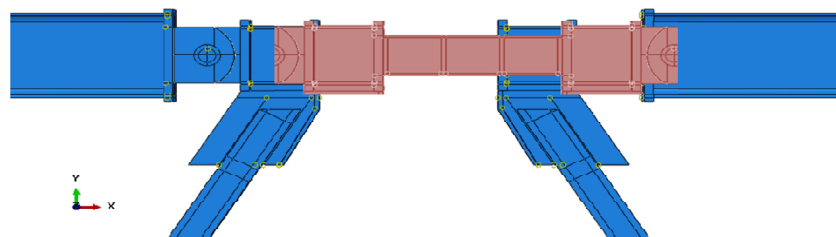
Articulated connection of the bond beam to the out-of-bond beam.
